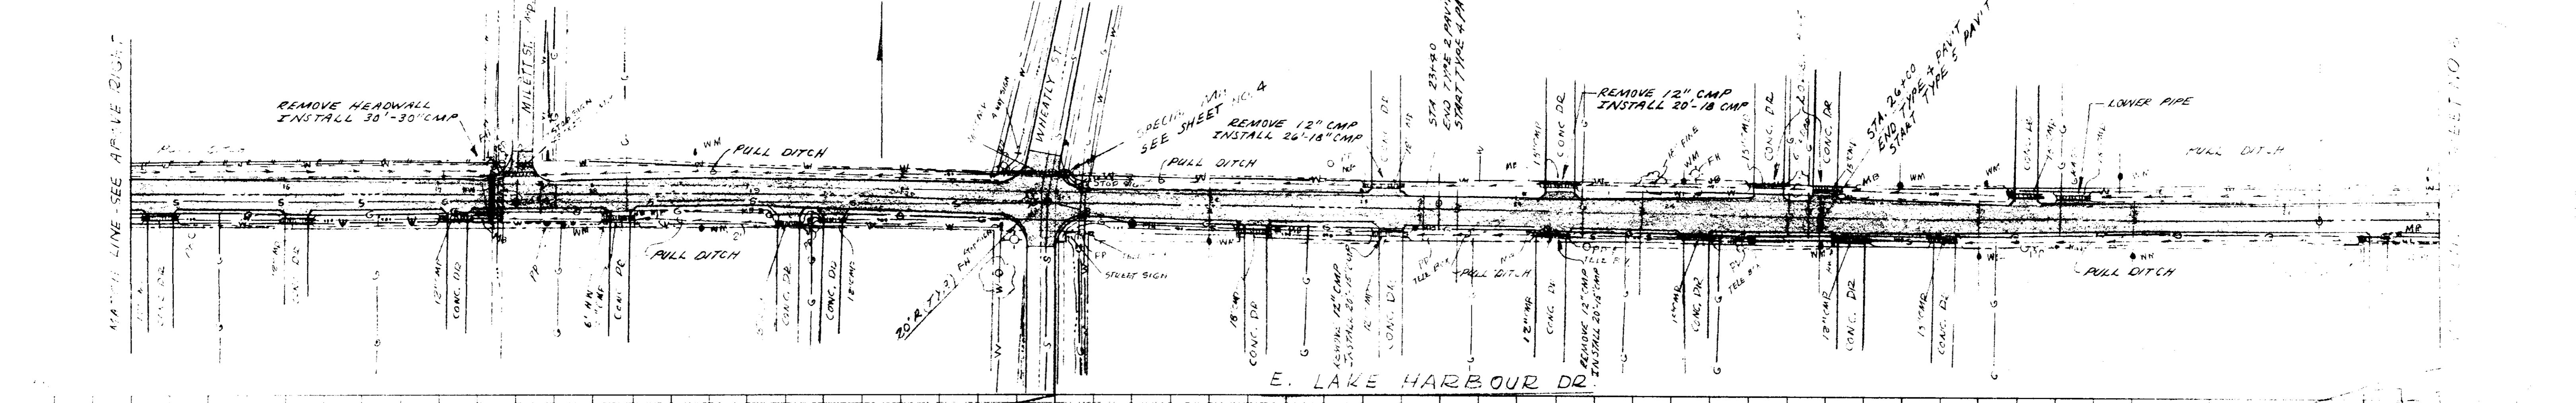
DOUBLE PLAN AND PROFILE-FULL LINE
